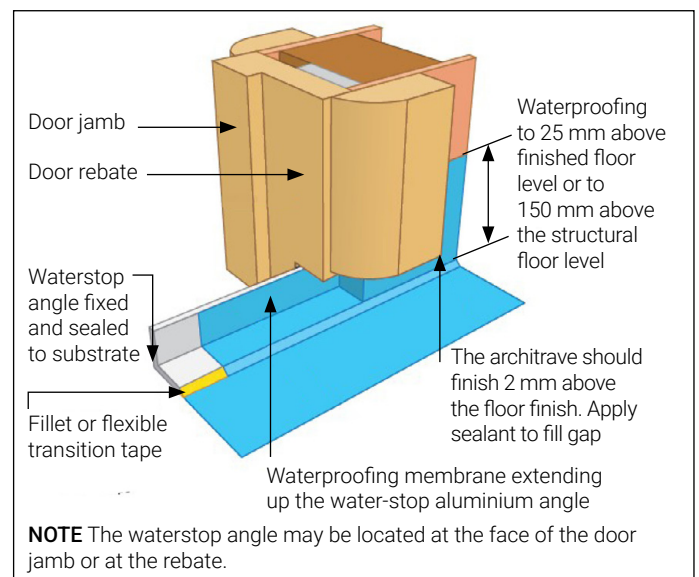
Typical bathroom cavity sliding door waterproofing detail - AS3740:2021 Figure 4.9.1(B)
